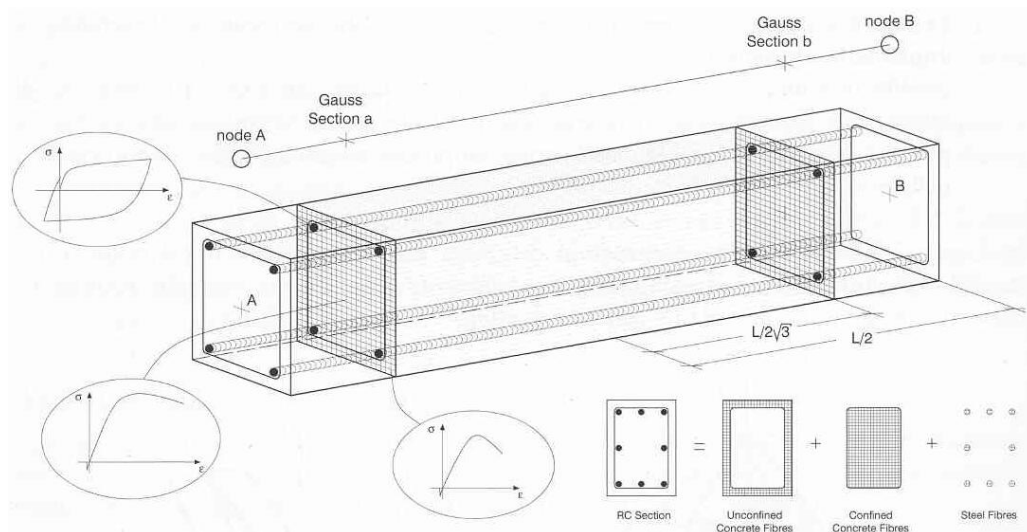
Fibre modelling of a reinforced concrete beam (Manfredi et al., 2007)
